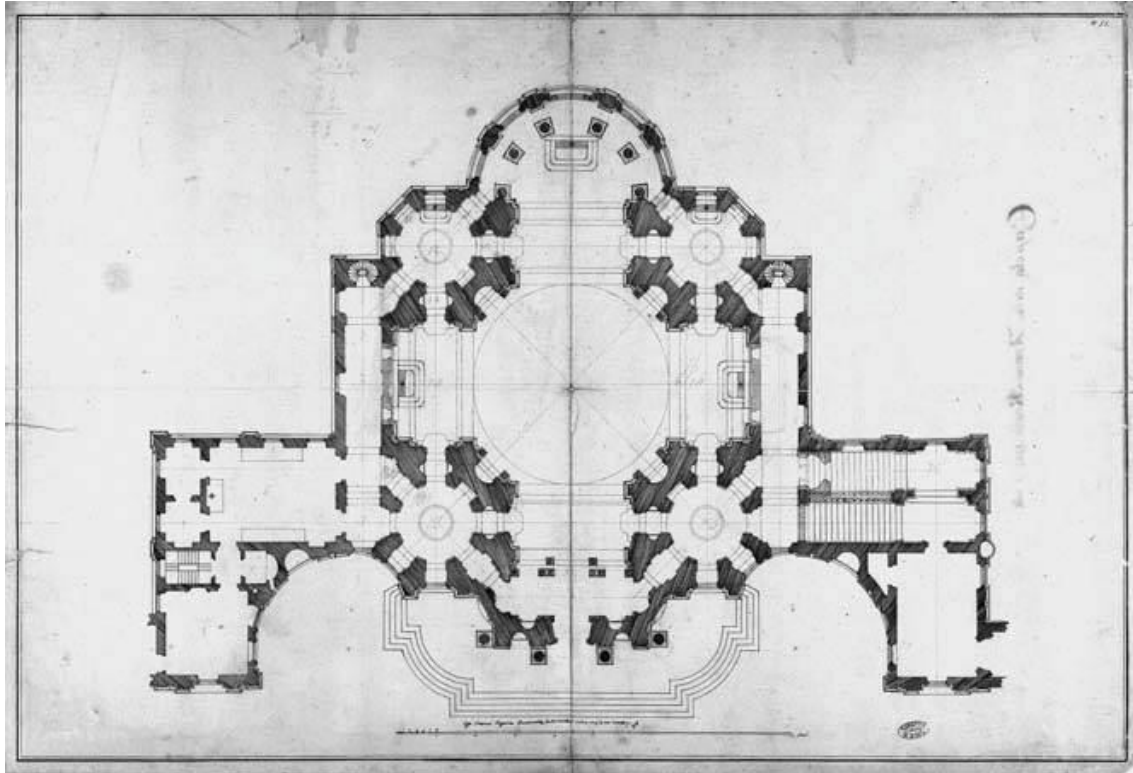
Plan of the church St. Uberto at Venaria Reale, 1716, F. Juvarra and/or collaborators
